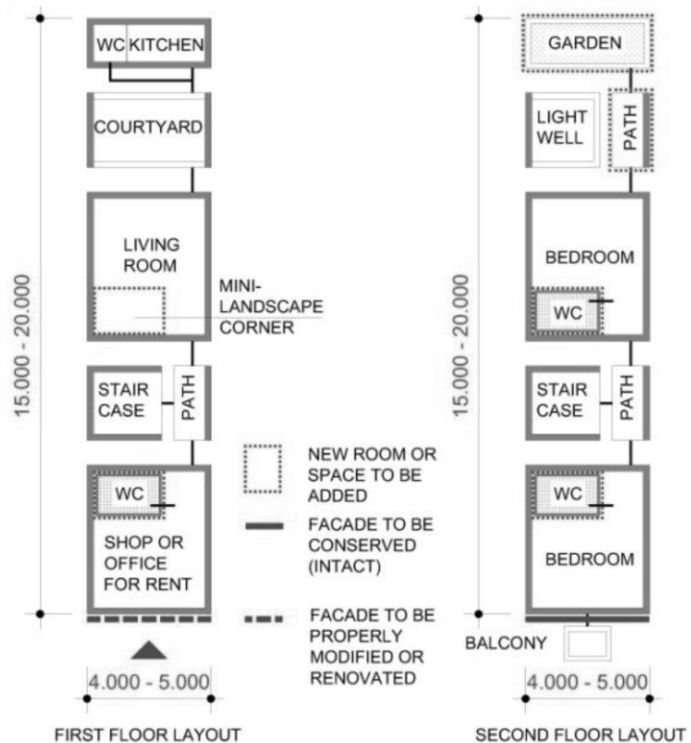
Renovation of floor plans for a typical French colonial shop-house [5]
